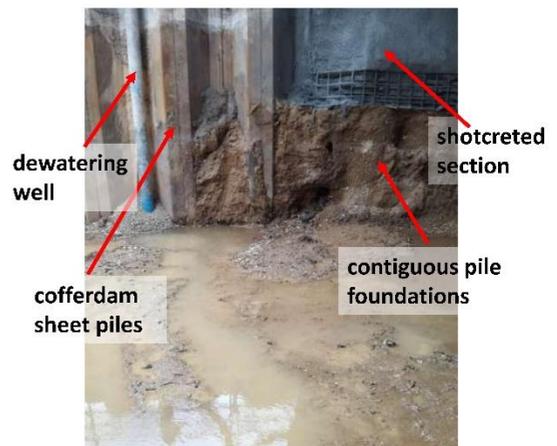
Water ingress at sheet pile and overbridge contiguous piled foundation interface.
